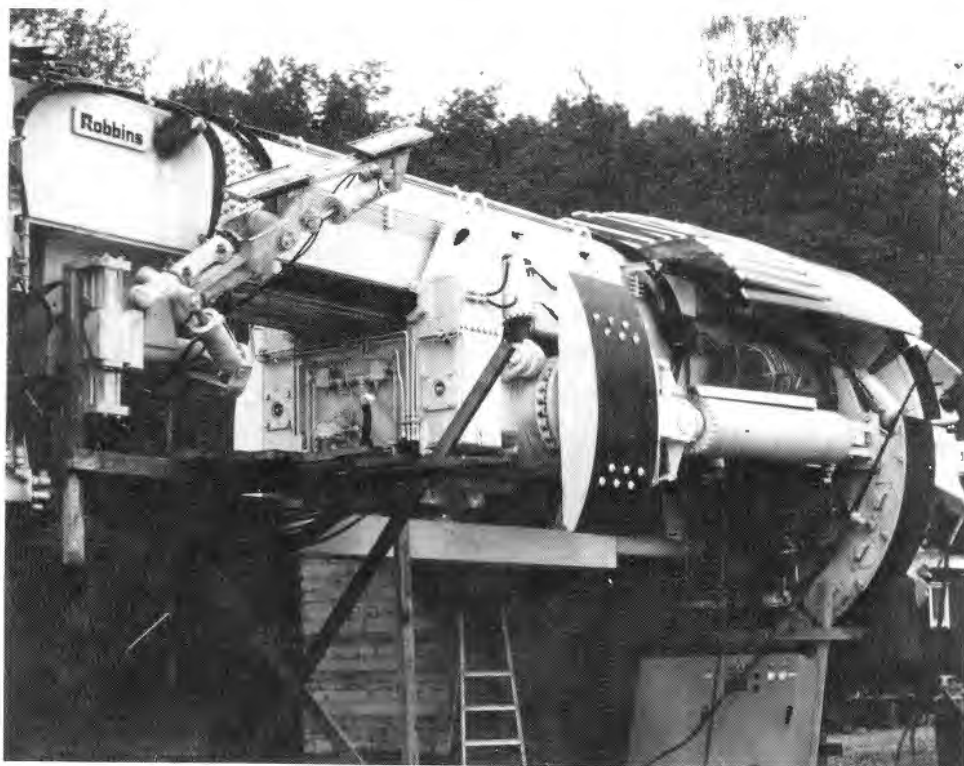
Articulated support arm employed for drilling ahead of tunnel face
